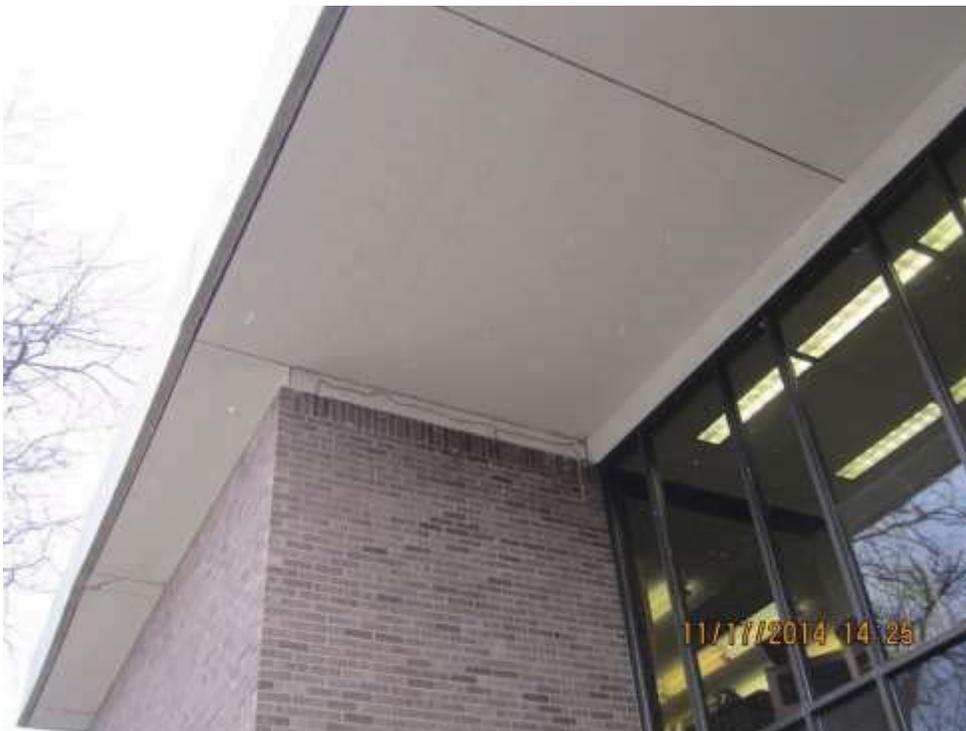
Example of localized cracking and sealant repair of stucco/plaster soffit.
